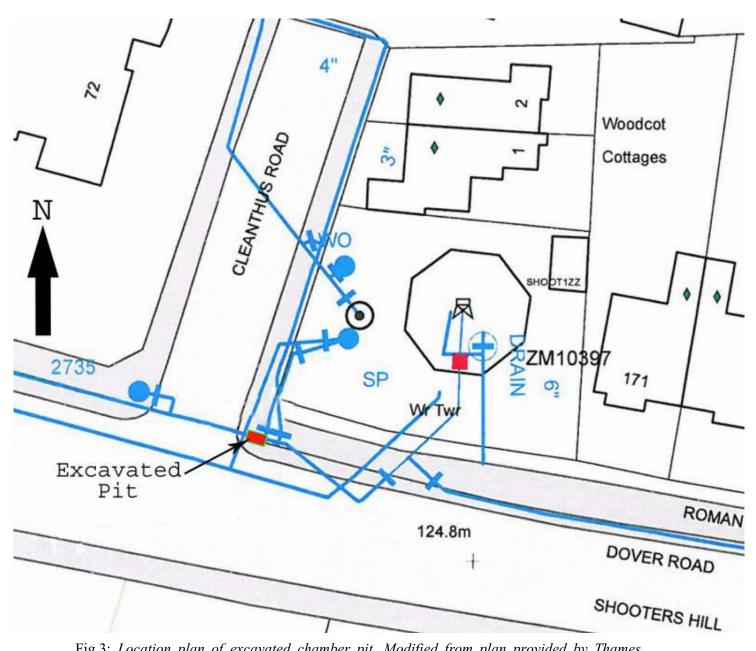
Location plan of excavated chamber pit. Modified from plan provided by Thames Water and used in WSI. (Scale 1:300)
